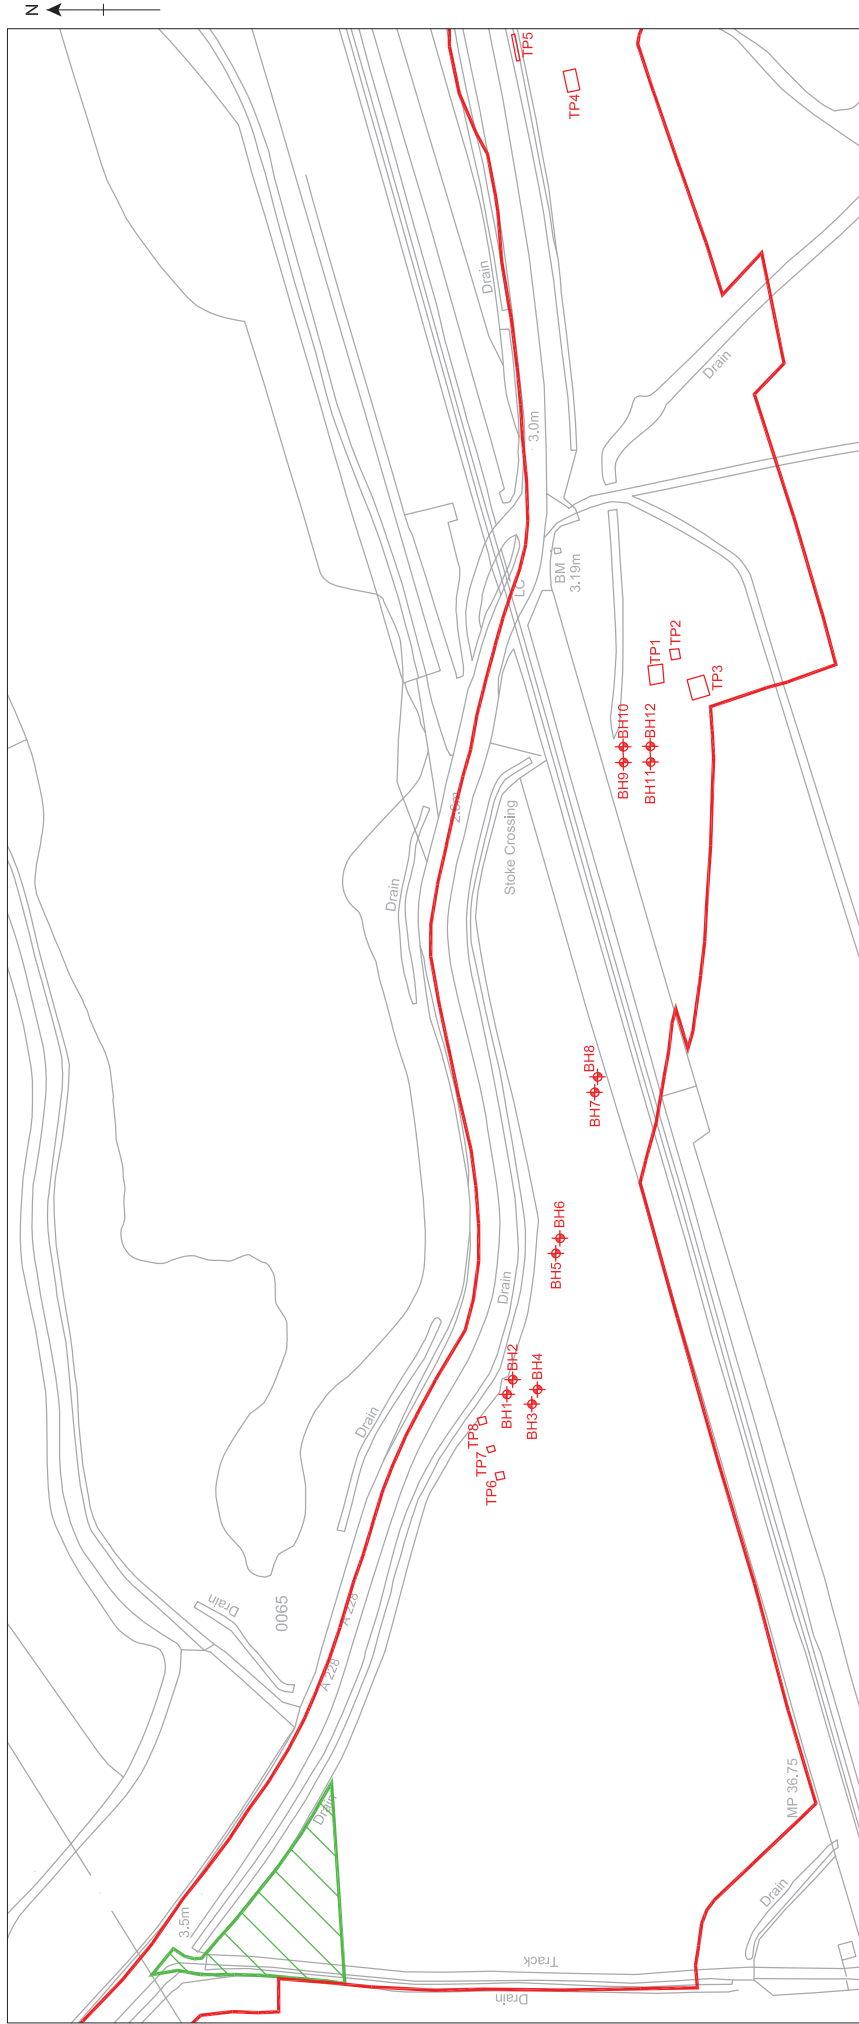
Main Site: Plan, Test Pit Locations (1:1500) and Sections (1:50)
